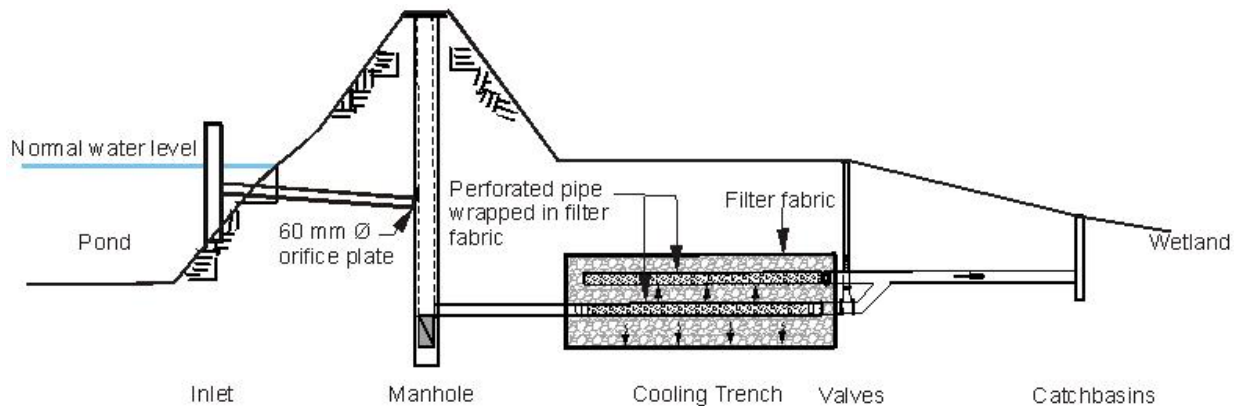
Cooling trench design – cross section (see Appendix A for details)
